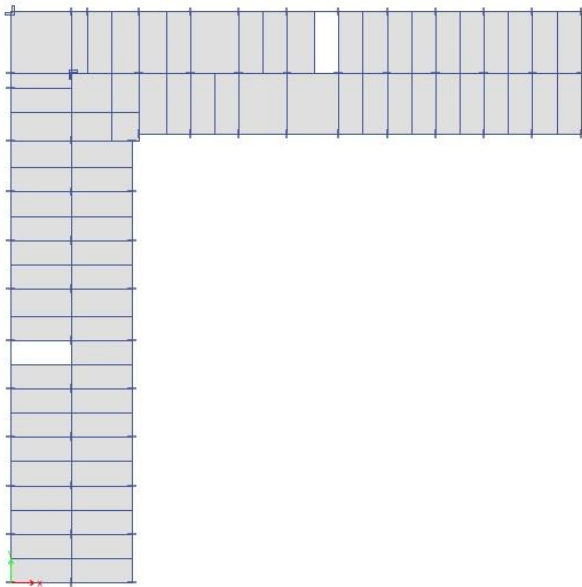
Plan View of G+ 7 Model with Rectangular Shaped Columns
